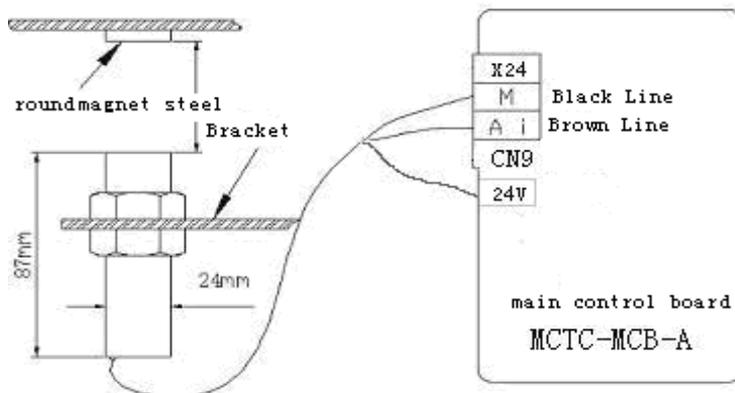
Installation sketch of weighing transducer (Transducer connected to the main control board)
